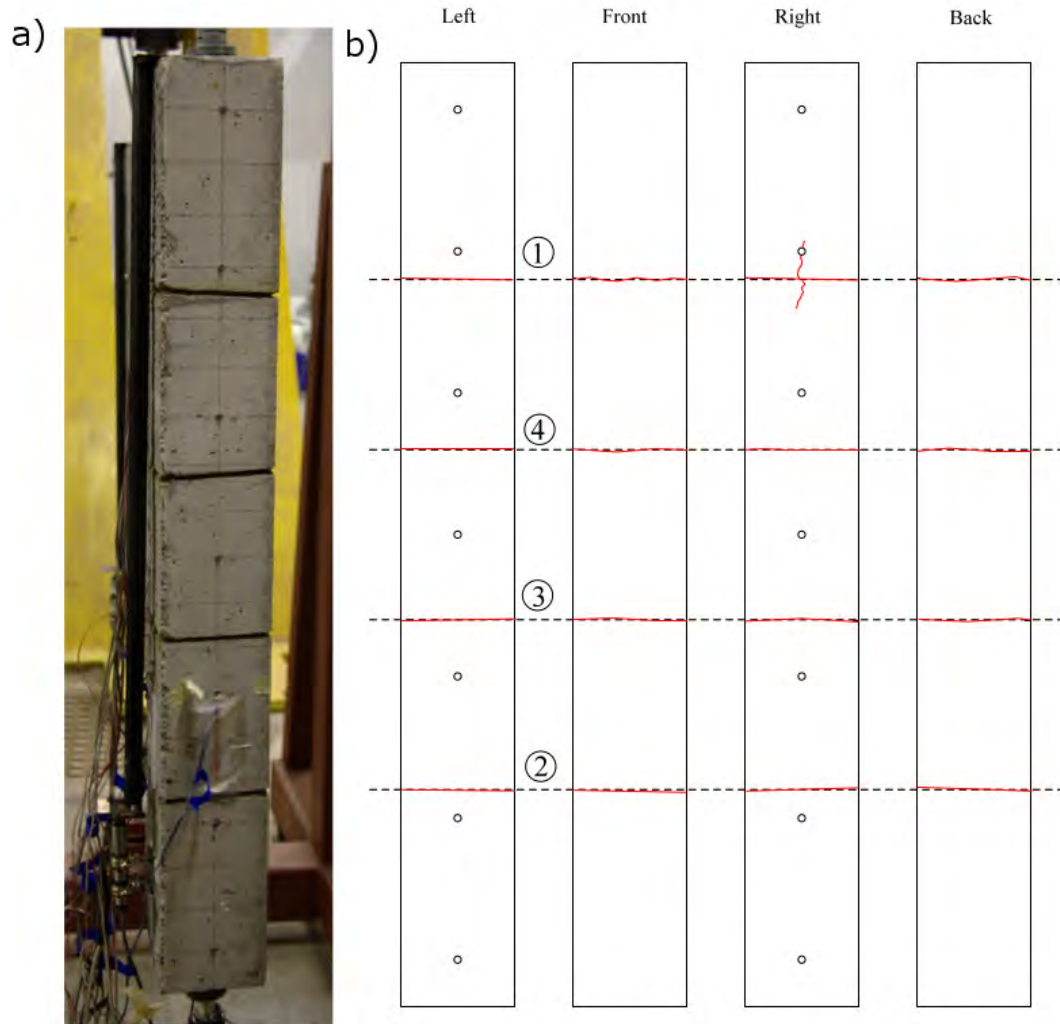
C2F16ni: a) specimen during testing b) crack pattern.
